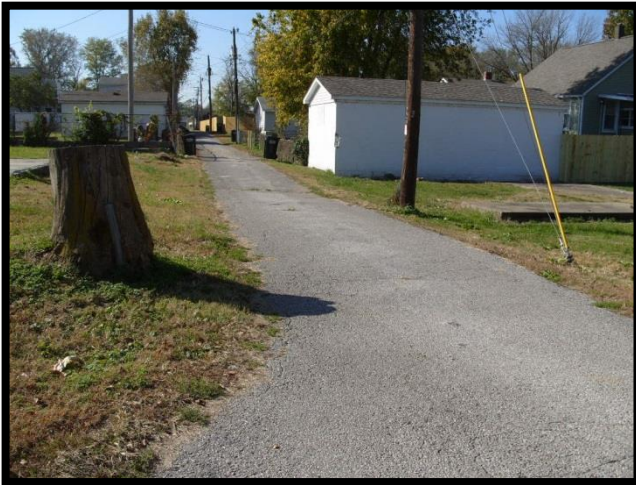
200 Allen Street (view from corner of Allen and Terry Streets).
